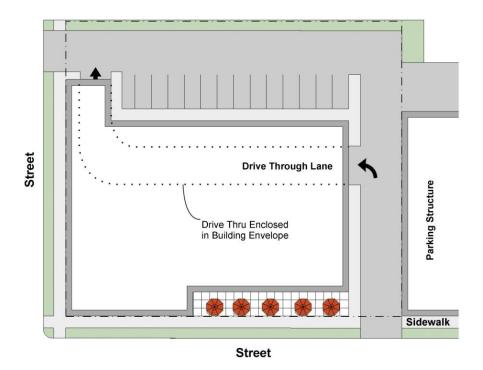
Transit Context – Drive-Through Enclosed in Building Envelope
